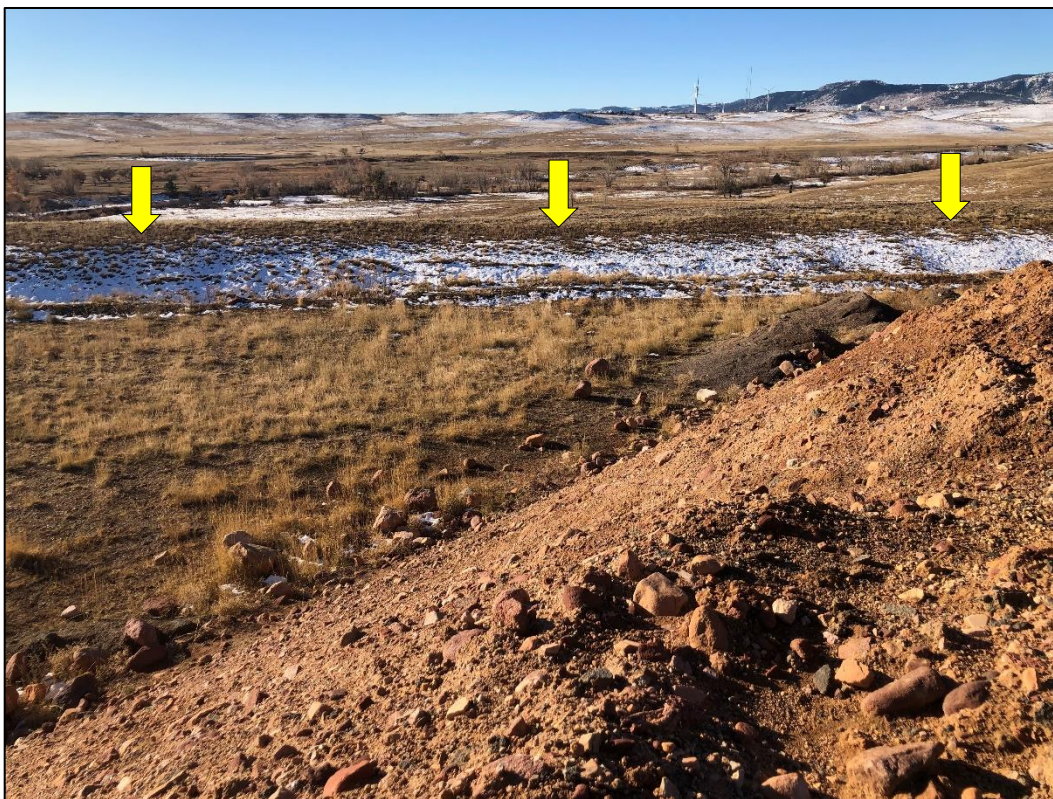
View looking south across top of lower lift placed inside pit in north mining area. Note side slope of upper lift (in foreground) at ~1.5H:1V. Also note southern rim of pit (indicated in background).
